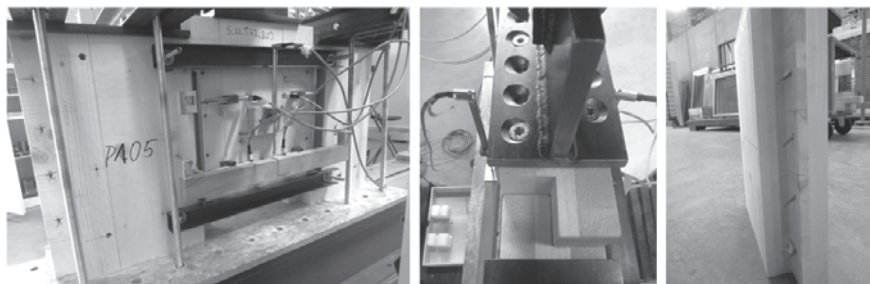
test configuration applied for a shear loaded wall-to-wall joint equipped with parallel screws (internal designation S_V2_T72)
